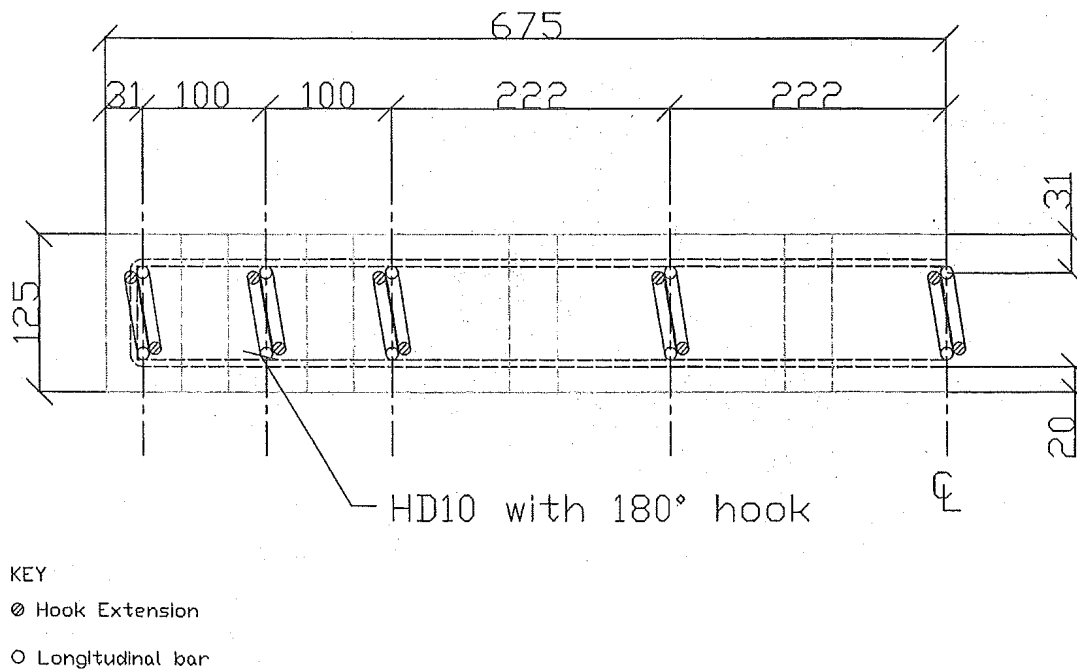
Cross-section showing longitudinal reinforcing layout.
